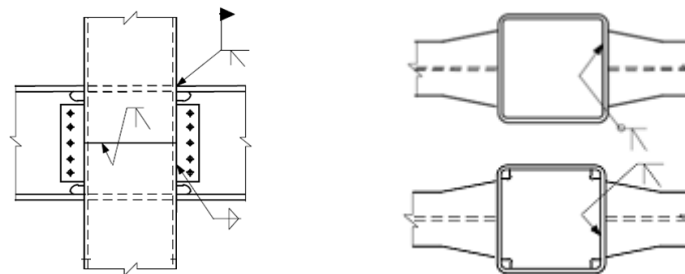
Beam-to-column connections with internal diaphragms [51]
